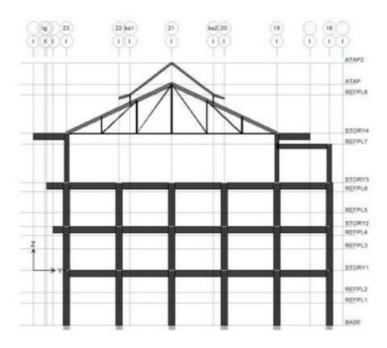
Modified roof structure of Auditorium (Wibowo et al. 2007)
